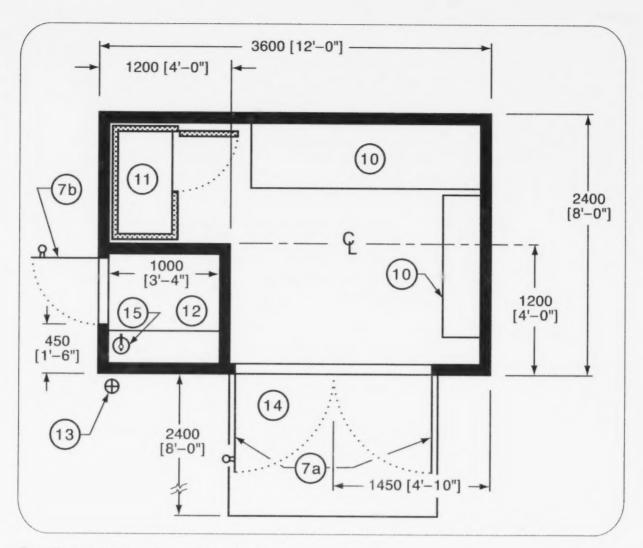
Floor plan (dimensions are in mm [ft-in.]).
